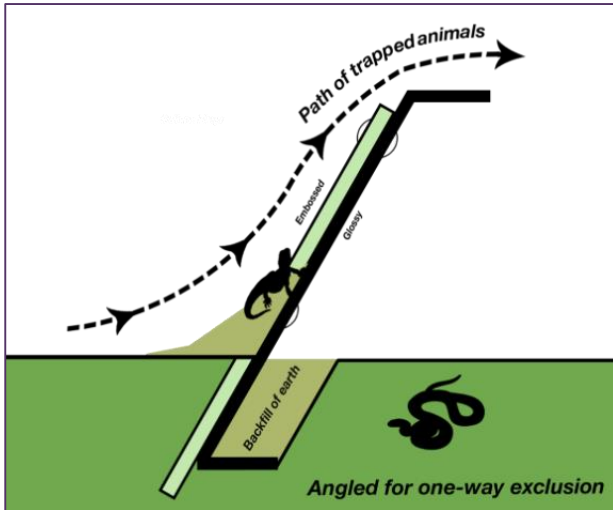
Animex wildlife fencing cross section (Photo courtesy of Animex)
